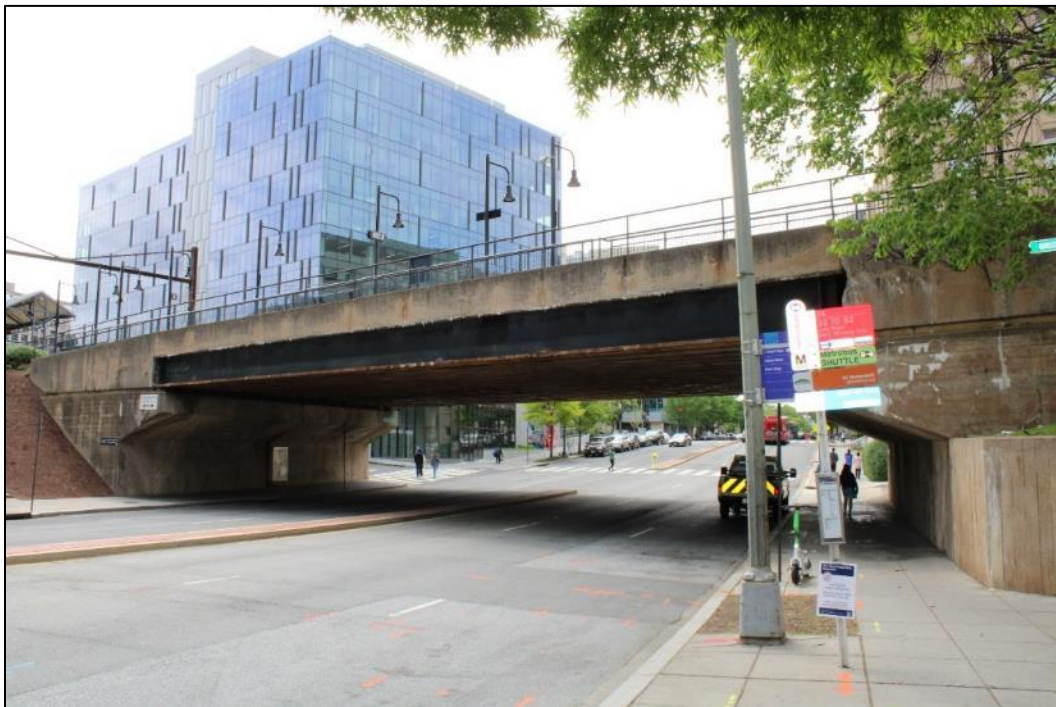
View of the north side of the 7th Street Bridge, facing southeast (VHB 2024).
